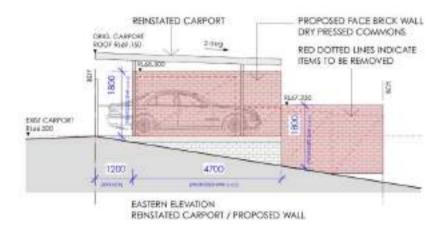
Brick wall adjacent to driveway of 497 Miler Street and 1A Pine Street
